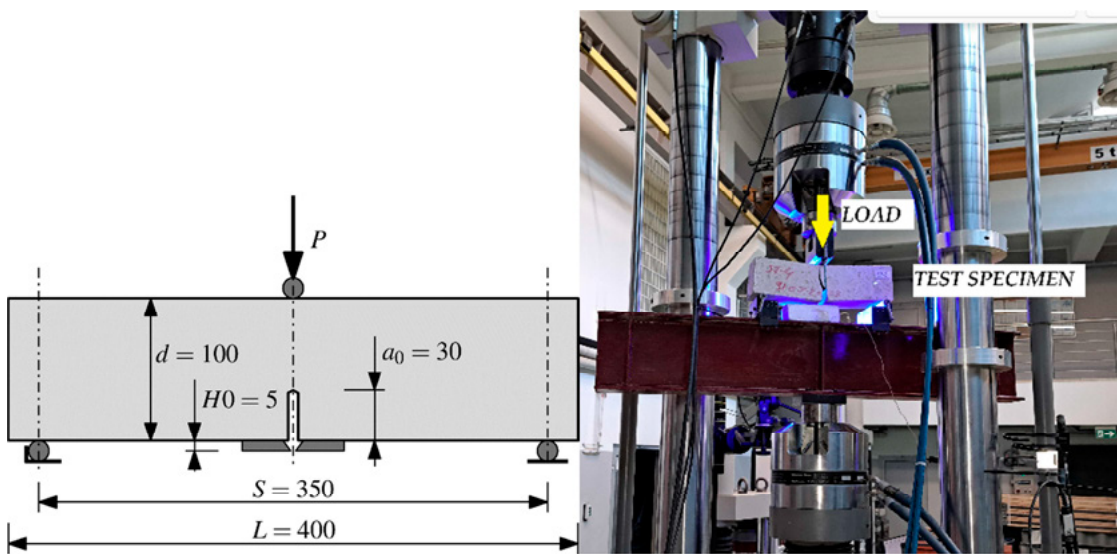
Test set-up for fracture testing: a) configuration and geometry, b) specimen during the test
